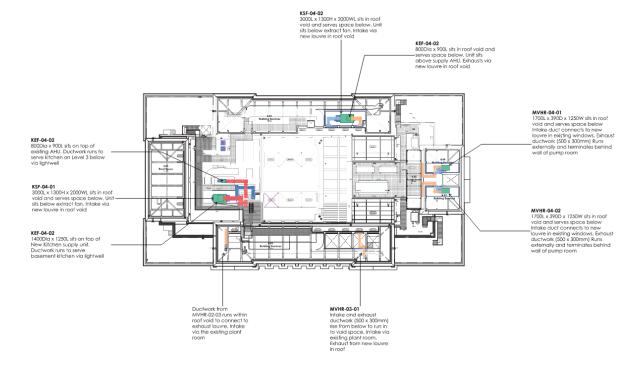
(above): Proposed fourth floor plan (new plant) (source: D&A Statement)
